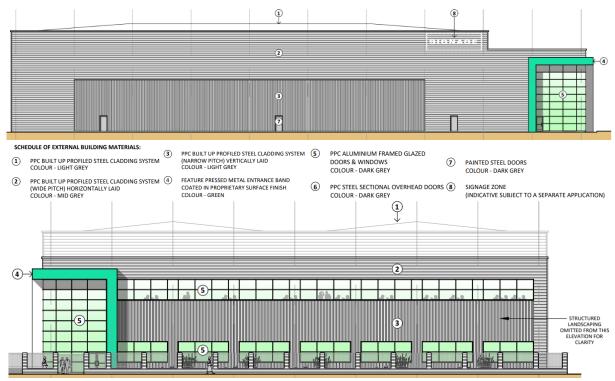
The side (east) elevation and Bennet Road (north) elevations
